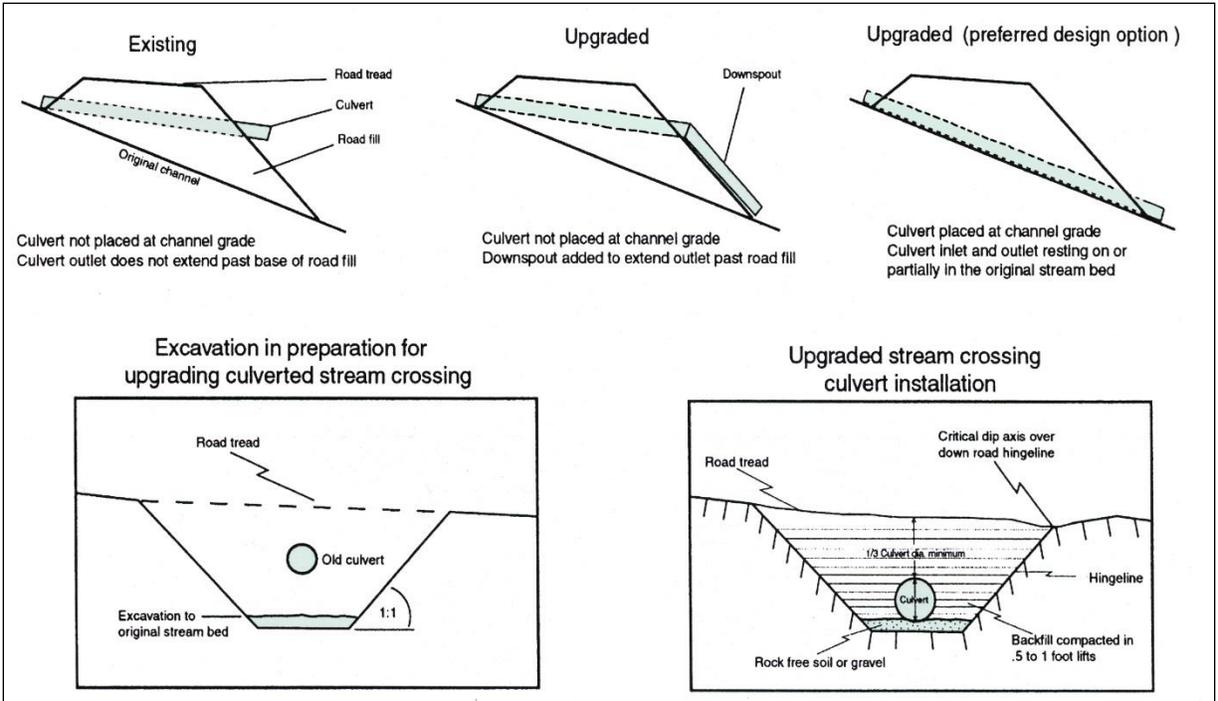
Typical culvert installation on non fish-bearing streams.
